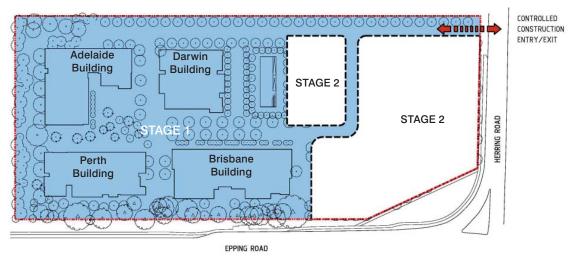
Stage 1 - Apartment buildings, streets and landscape
